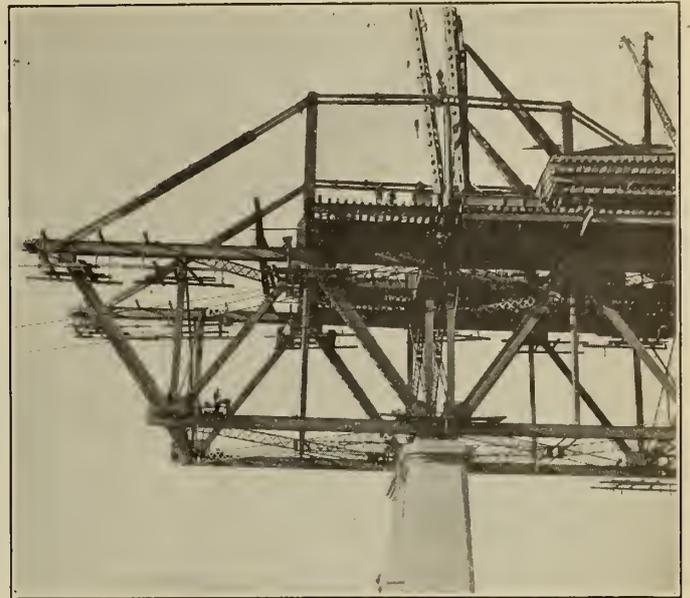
South Approach—Cantilever Erection of 245-foot Spans—Third Stage.
